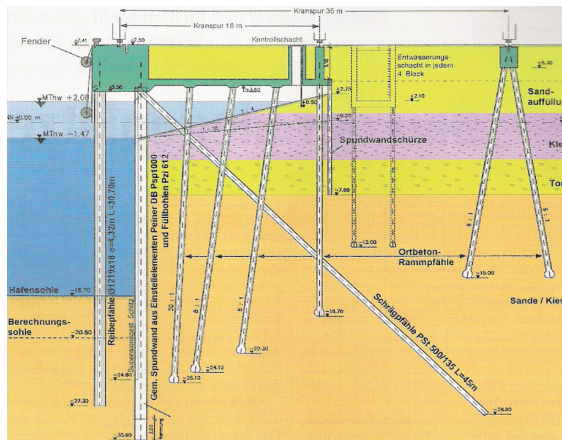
Cross-section of quay wall Alterwerder, Hamburg 2006 [Miller 2007]
